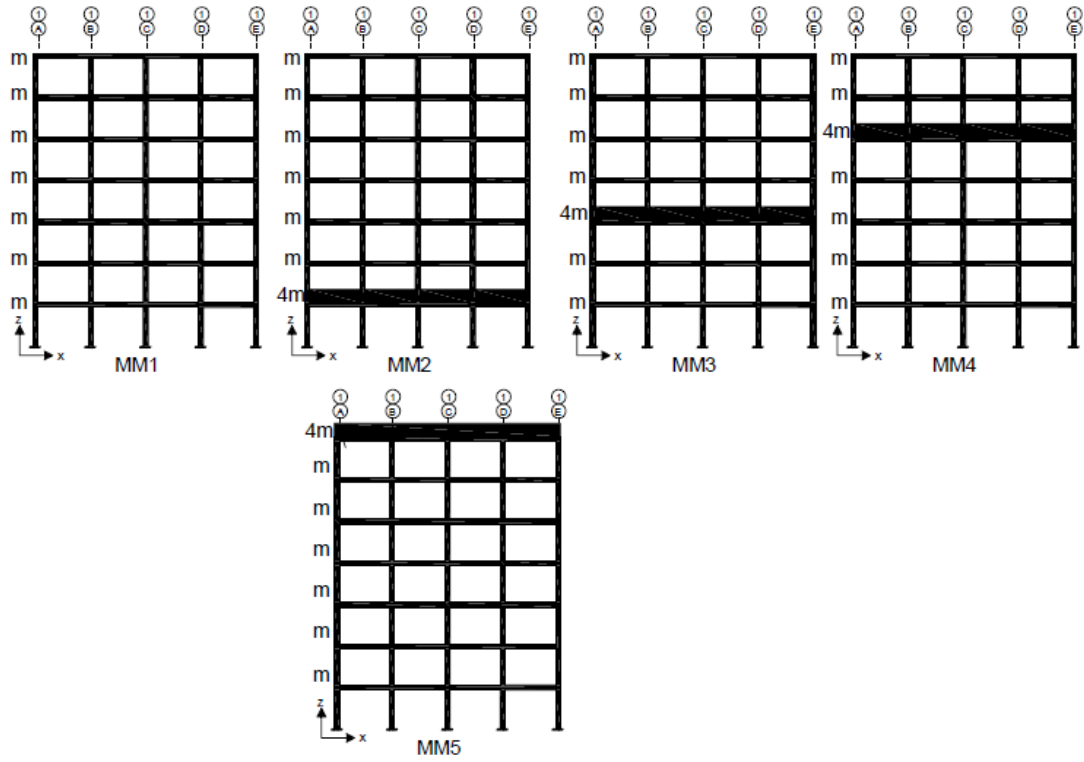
Elevation view of seven story RC frame (mass irregularity)
